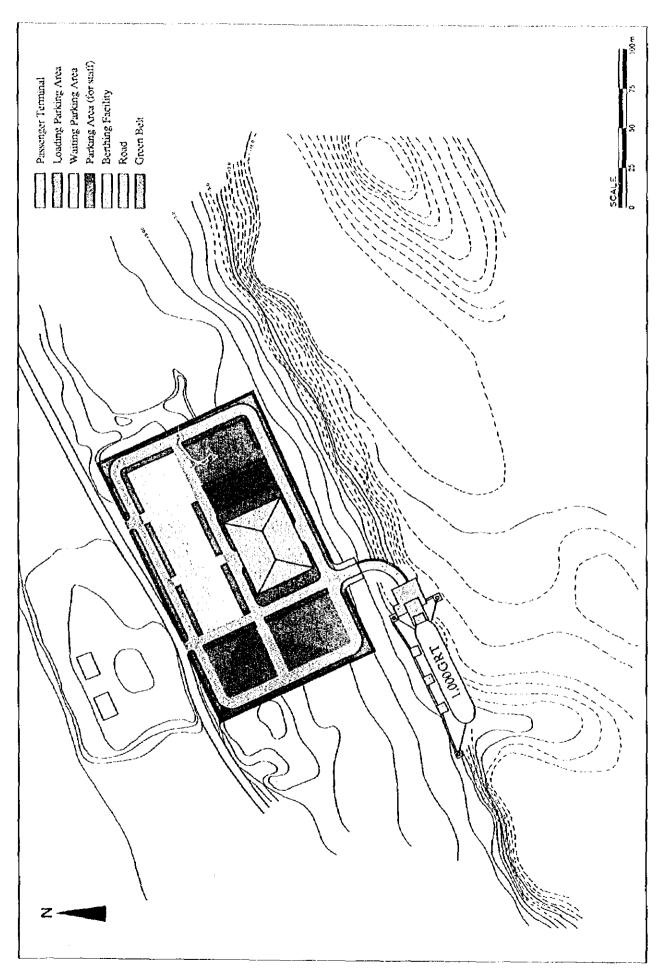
Layout Plan of Biak Ferry Terminal
